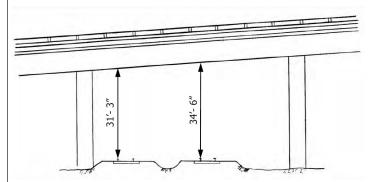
Bridge elevation view with two freight/passenger rail tracks below the bridge.
